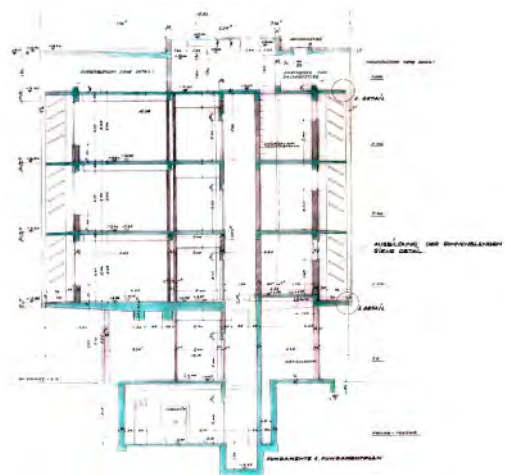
Section through the chancery. Note the double roof and deep-set windows with louvres (Matussek et al. 2010).
